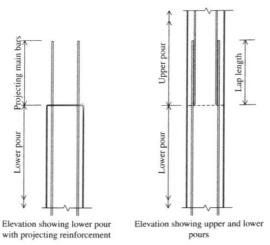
Lapped longitudinal reinforcement in a concrete column
